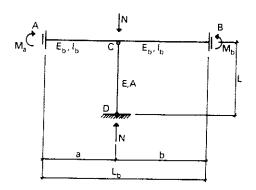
c. Fire exposed structure made up of a column CD hinged at its top end into a girder AB which is elastically fixed at its end
